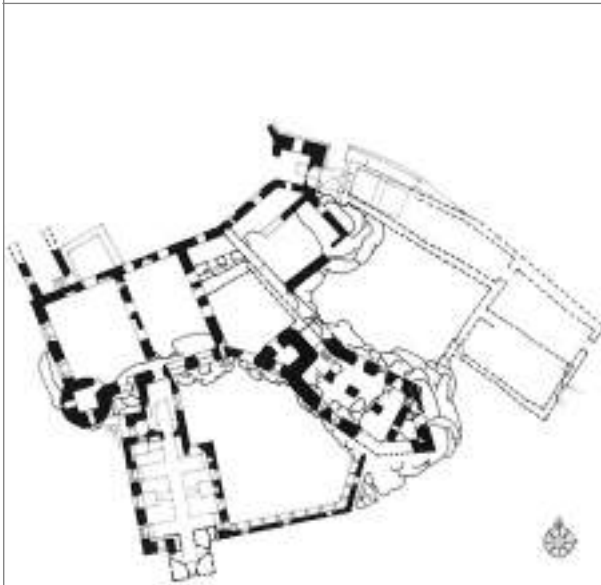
Reconstruction and plan, source: medievalheritage.com
